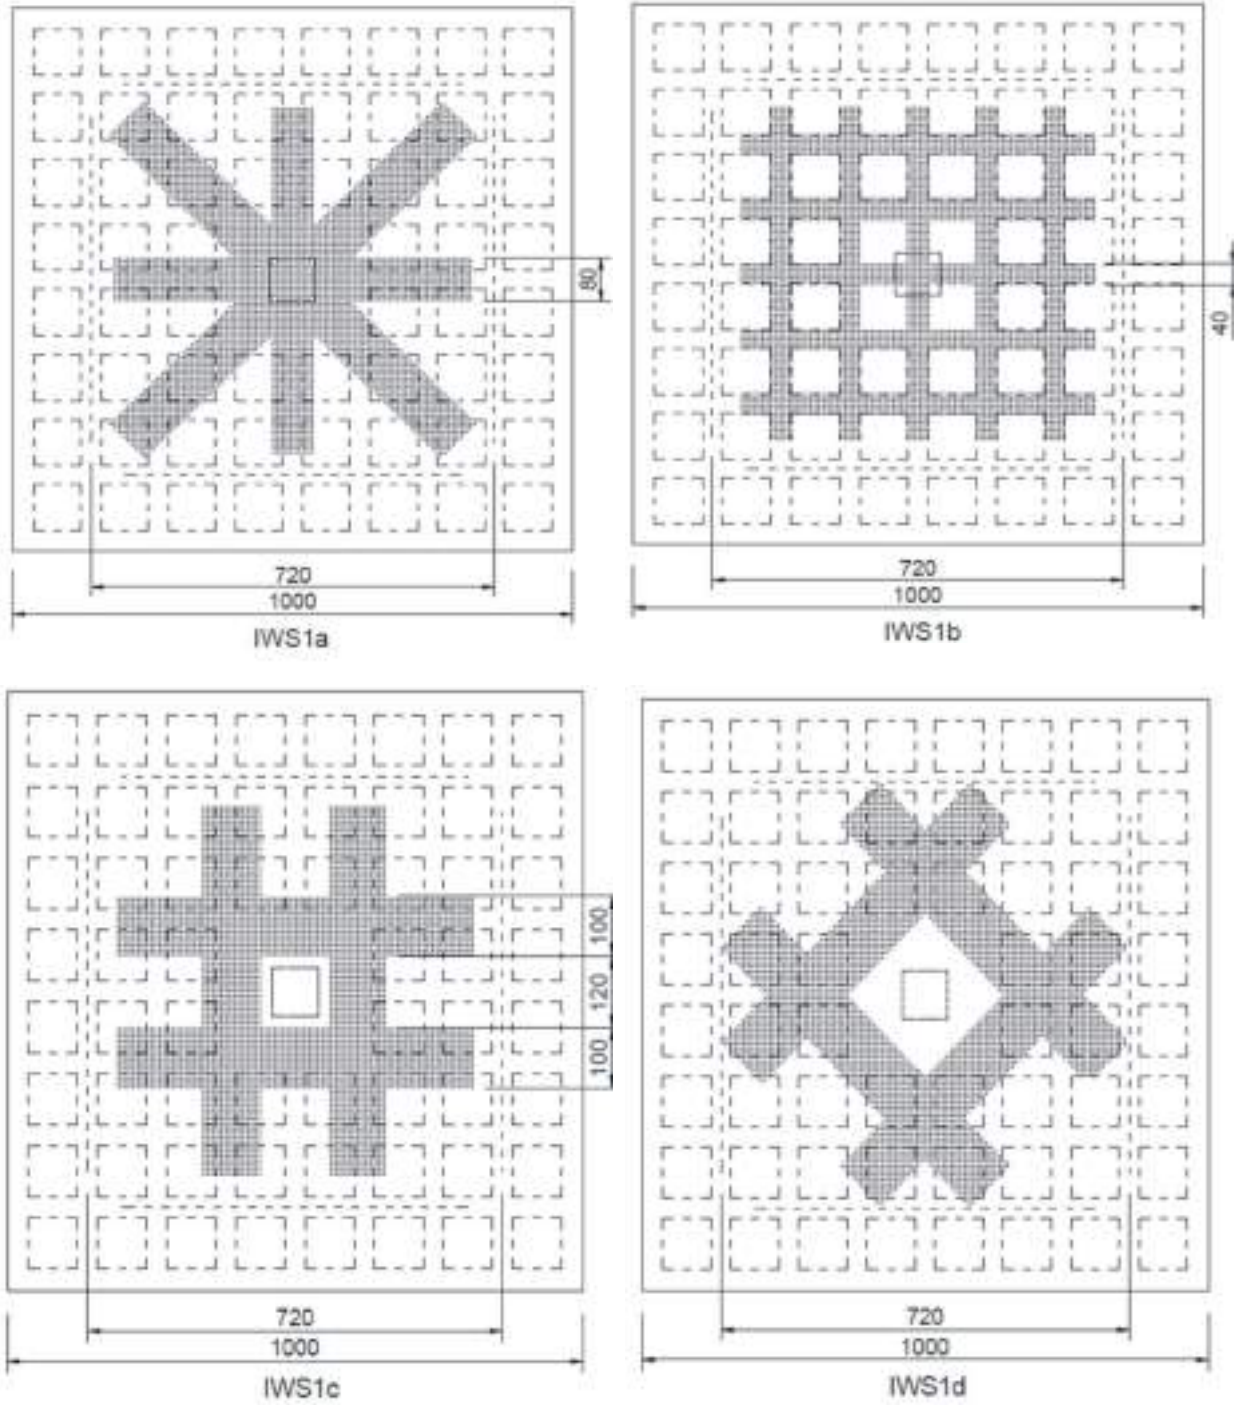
25 Waffle slabs CFRP strengthening layouts
